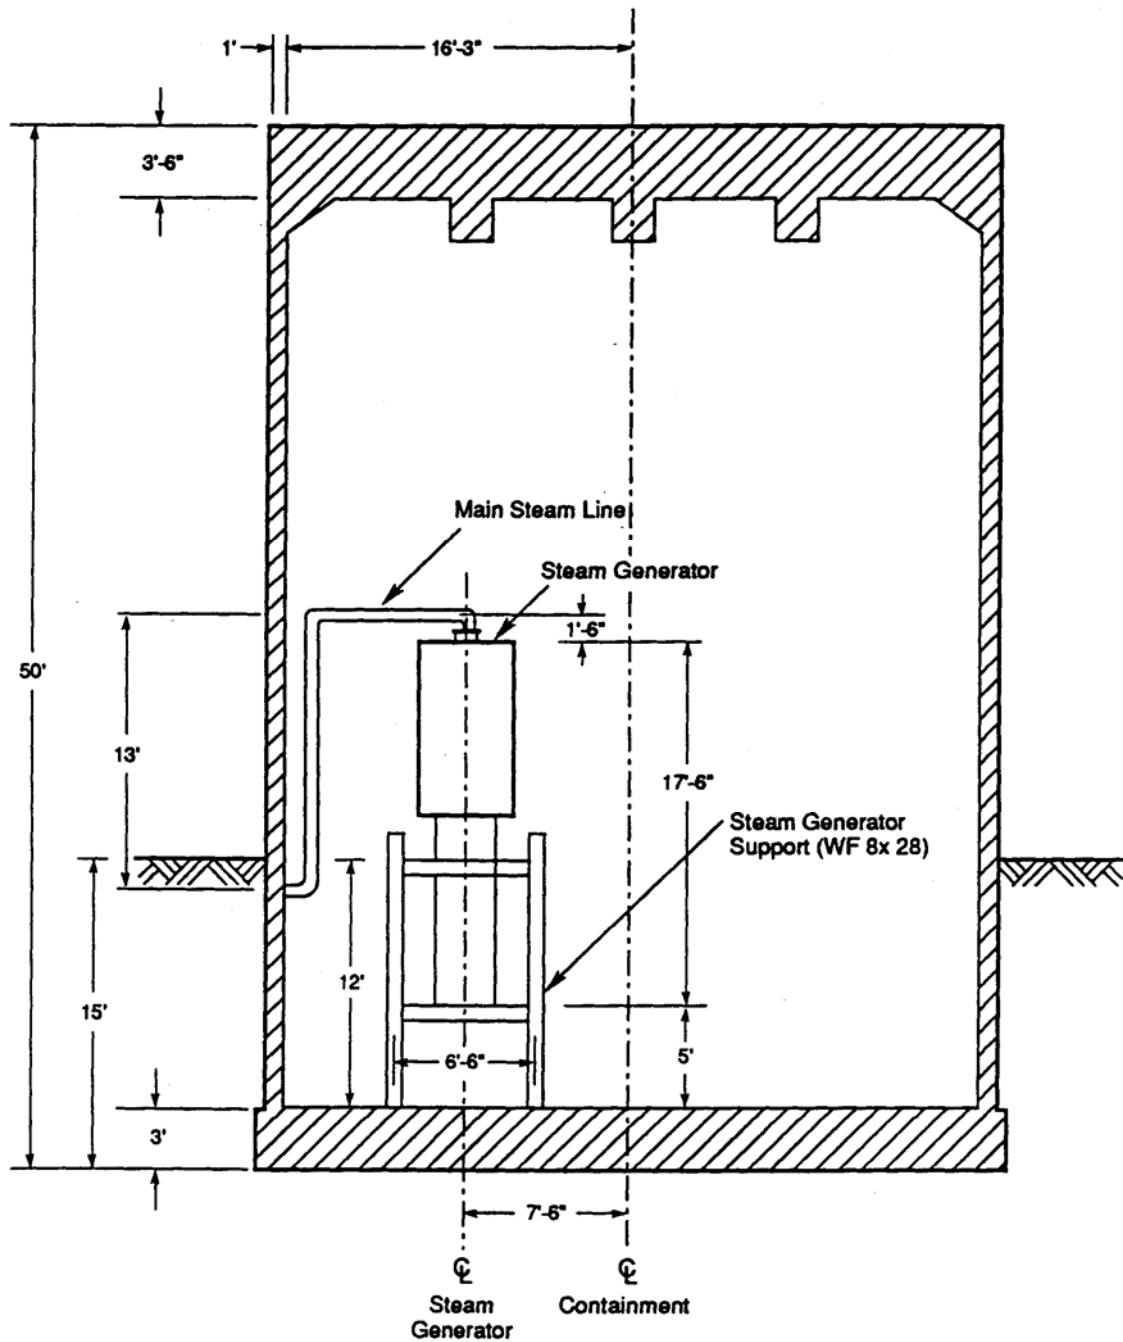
Vertical Cross-Section View of the 1/4-Scale Containment Model
